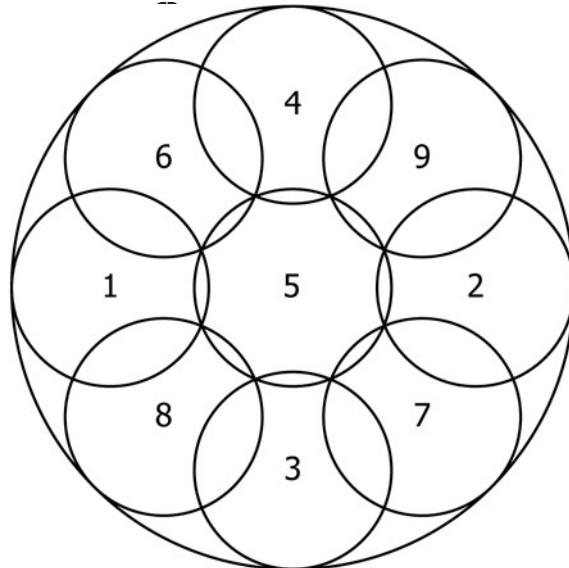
Rammer Pattern for Compaction in 6-in. (152.4-mm) Mold
